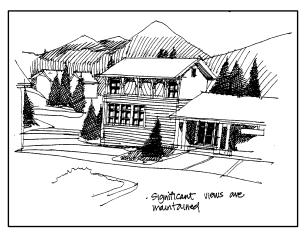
LOCATION OF PARKING AND BUILDINGS
